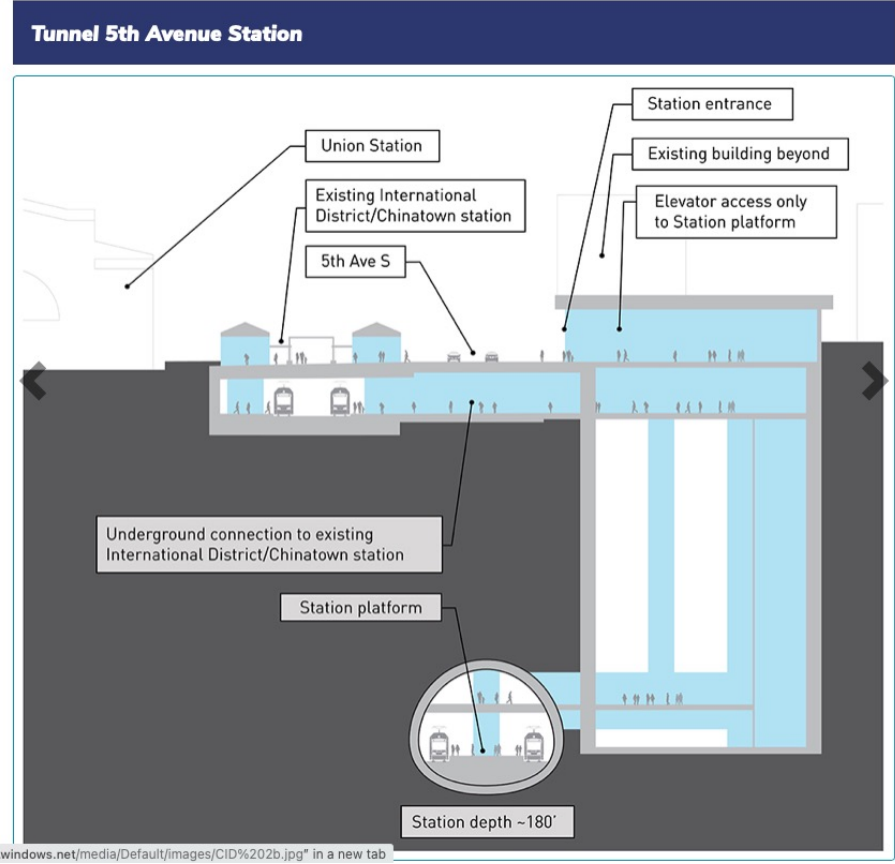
Plan and Profile for 5th Avenue Deep Station Option (CID-2b)
